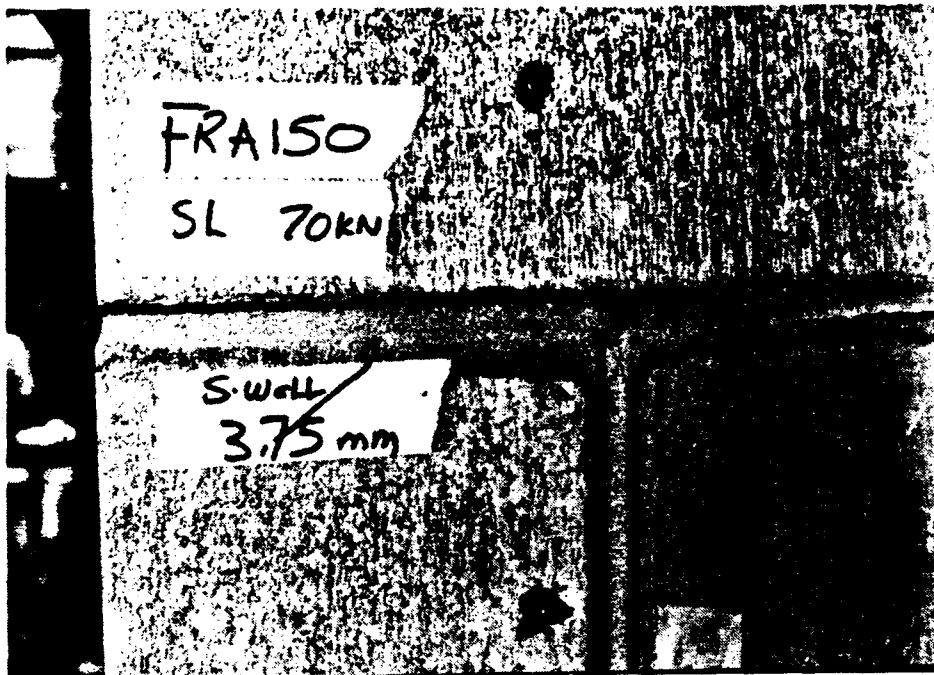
Back View of Crack Distribution at Failure on Specimen FRA150
